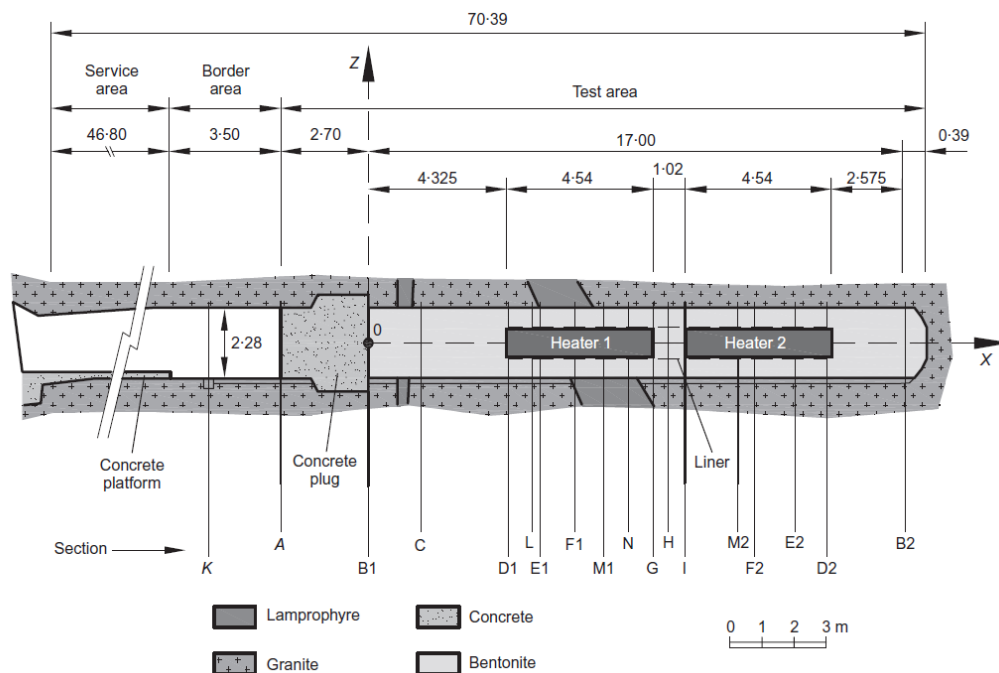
Layout of FEBEX in situ test (Gens et al. 2009)
